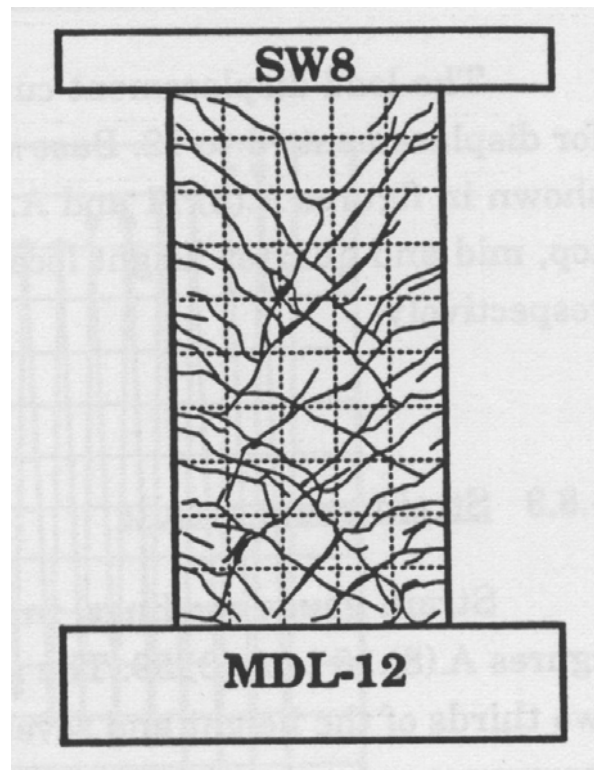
Condition of wall SW8 at 1.00% drift [Pilakoutas (1991)]
